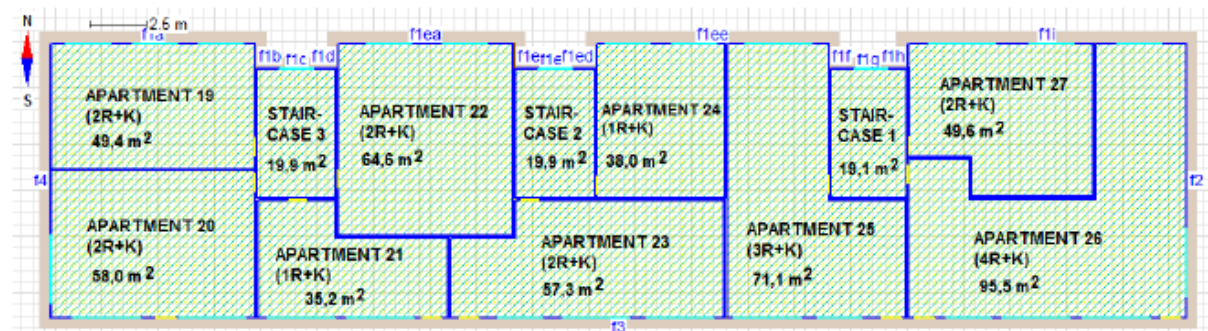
Floor plan of the first floor of the 1960s apartment building
